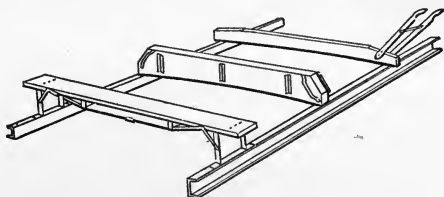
Wood Tamping Templates and Light Bridge for Furnishing Concrete Roads.
